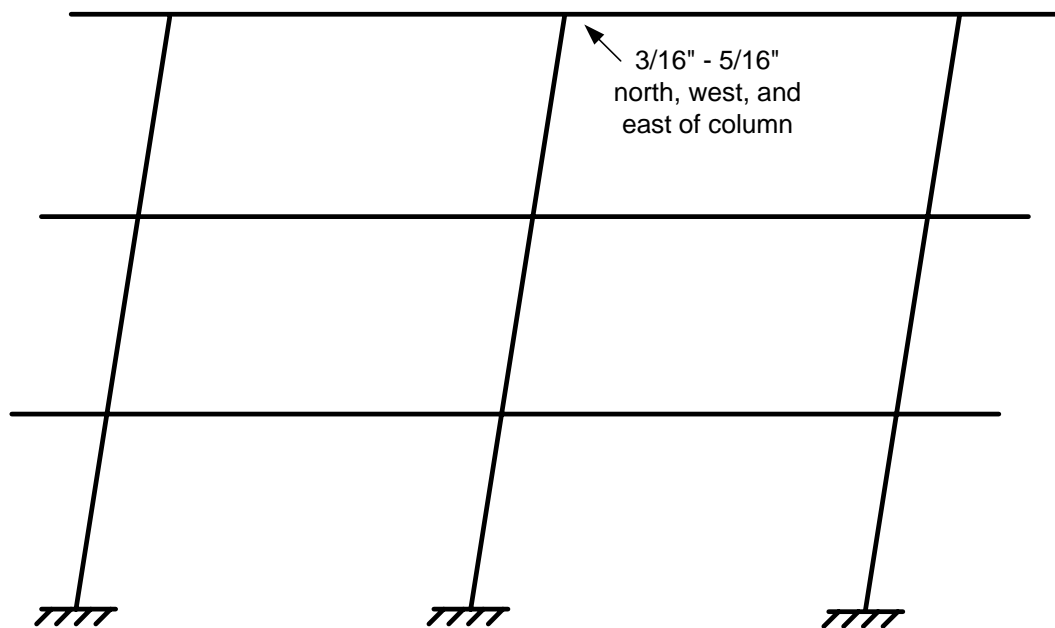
Vertical Slab Separation Frame B, North 3% Roof Drift
